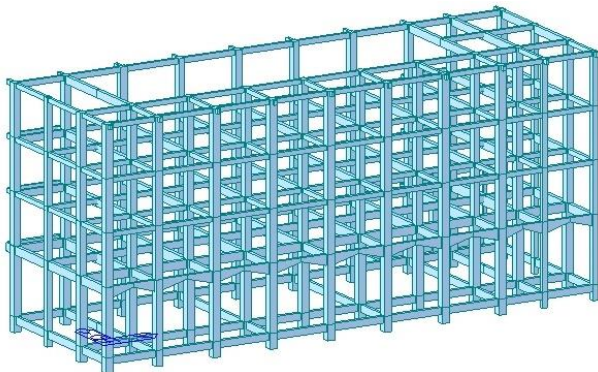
Working model of the four-storey classroom building based on the as-built plan.
